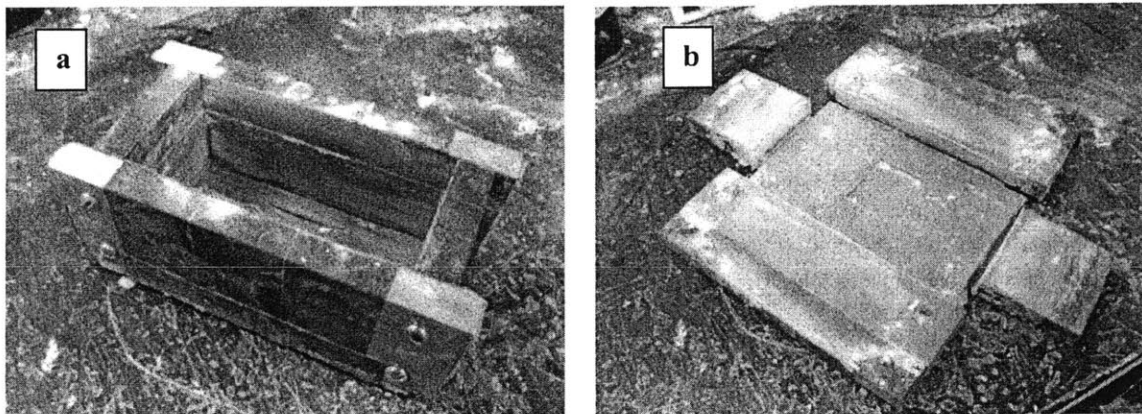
The steel mold used to cast the matrix of the specimens. a) Closed mold b) Open mold
